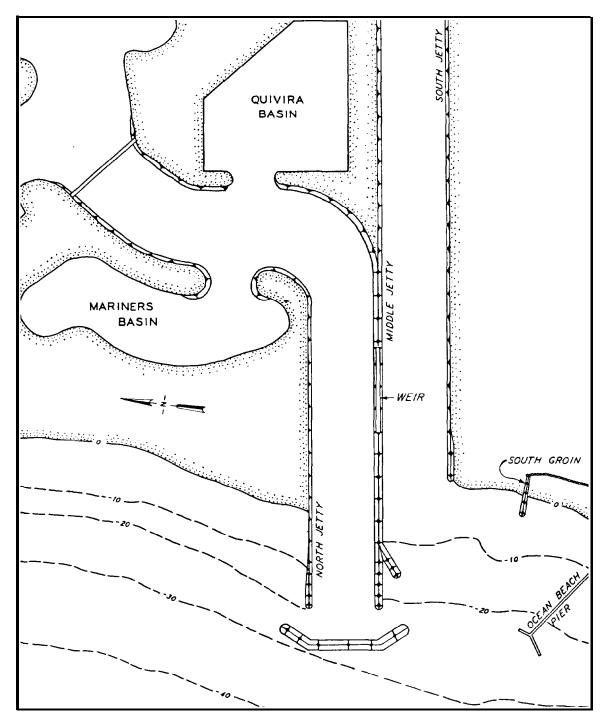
Improvement plan recommended for Mission Bay Harbor.
